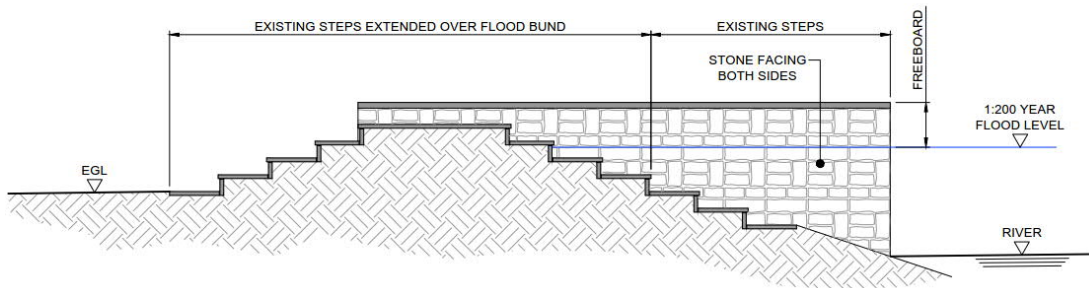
INDICATIVE ACCESS STEPS DETAIL
